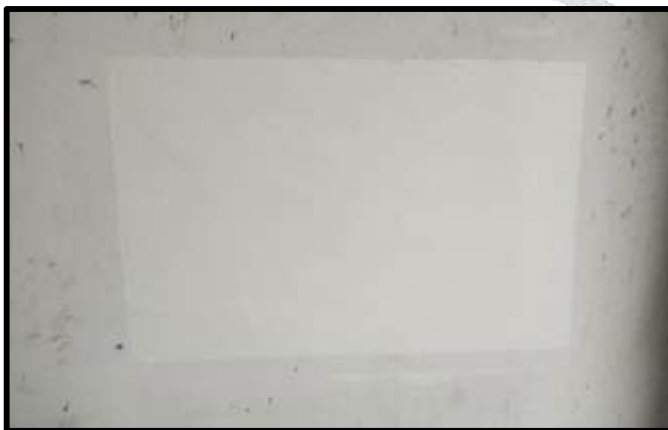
SAMPLING OF TERRACE WATERPROOFING
